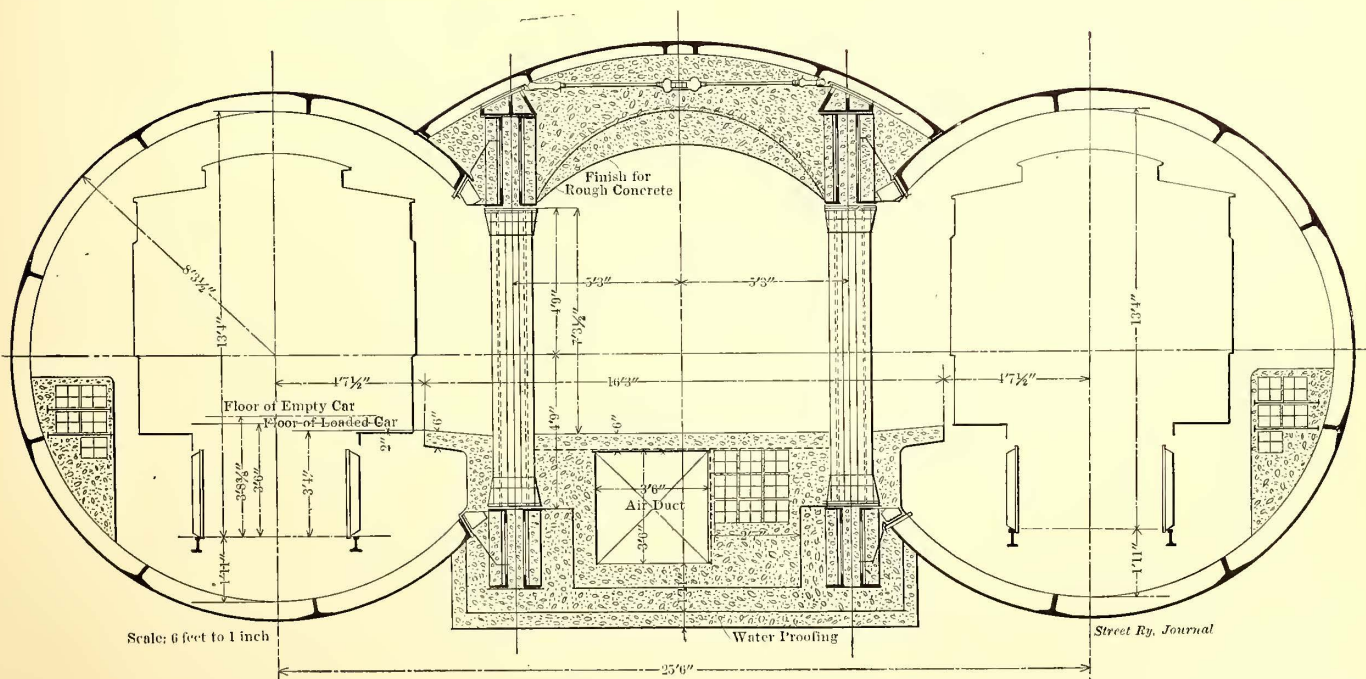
CROSS-SECTION THROUGH THE HUDSON STREET STATION, NEW YORK
